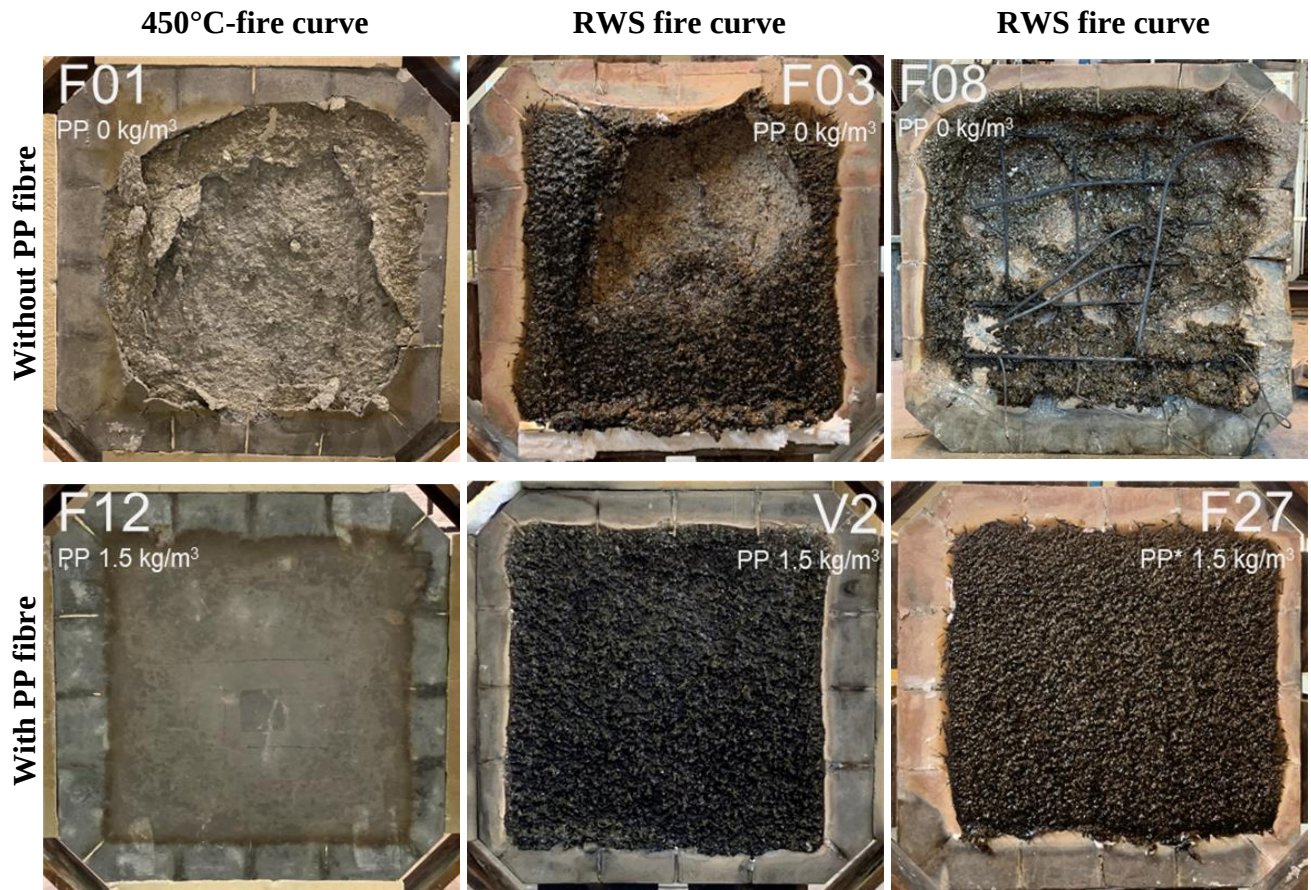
Exposed face of the specimens after testing (F08 is the reinforced-concrete specimen, the only with no steel fibre).
